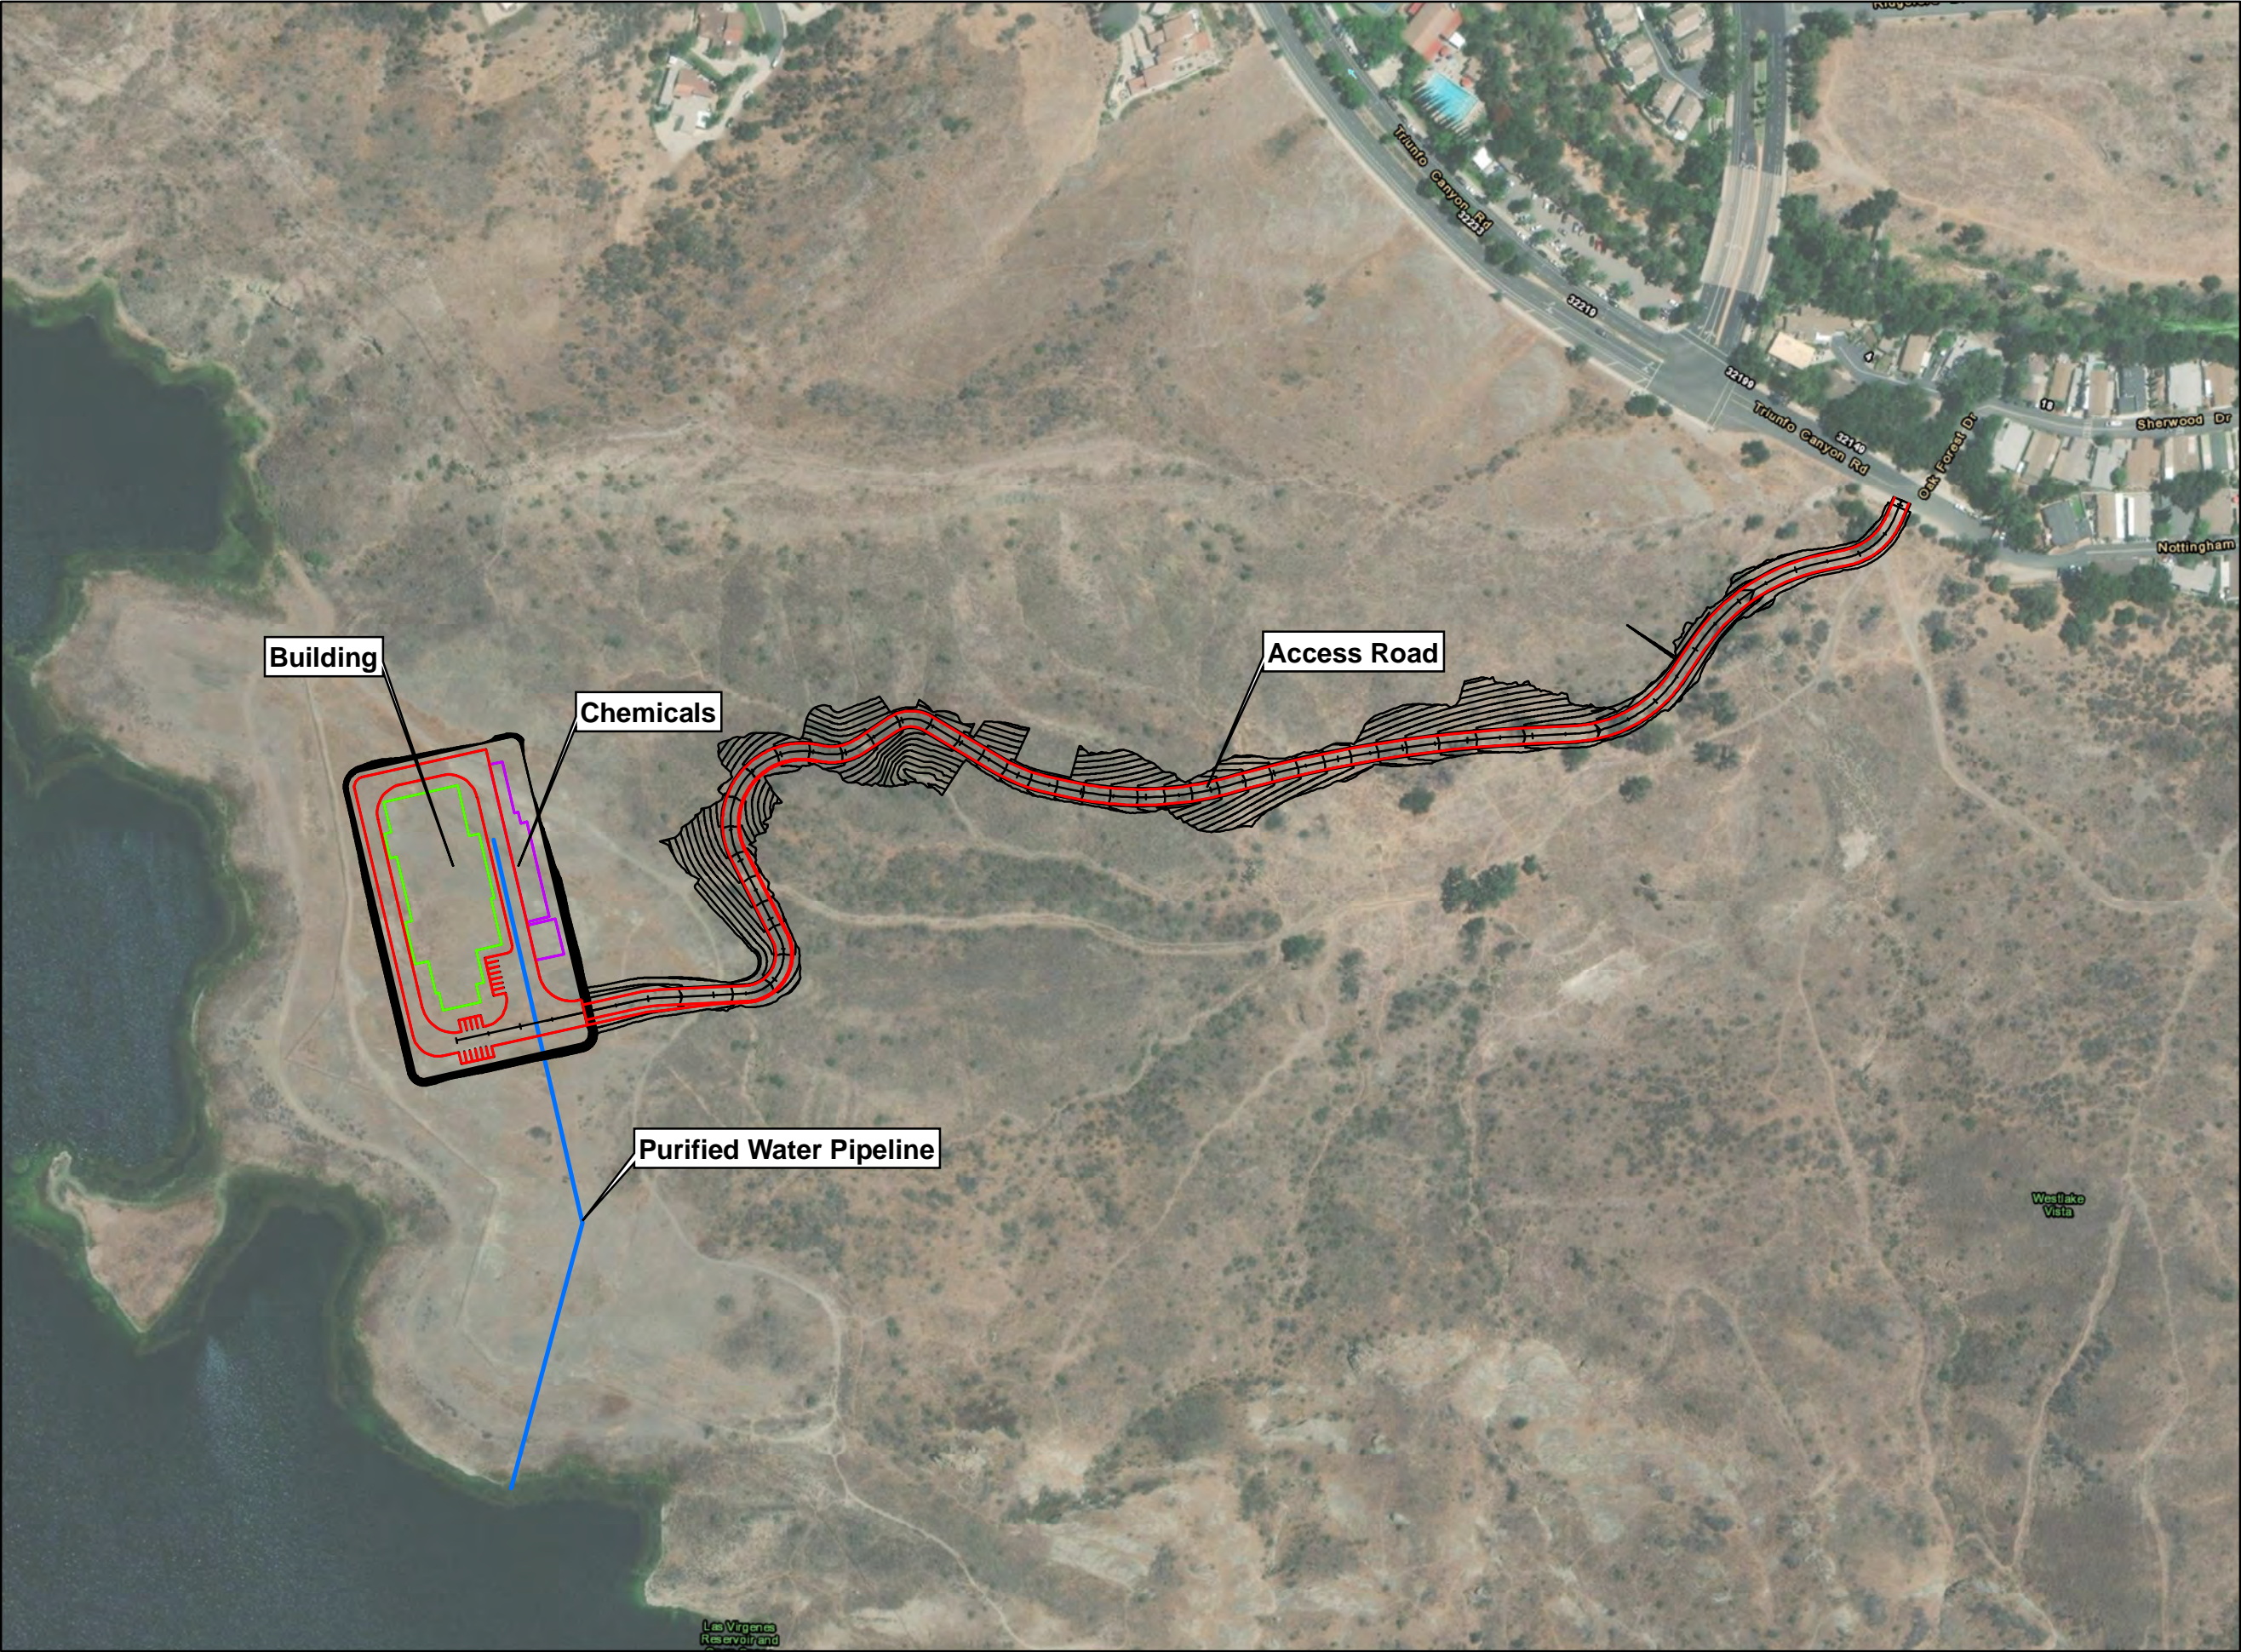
shows the conceptual design for the new access road. Additional details about new access road are expected to be developed over time if Alternative 2 Reservoir AWPf is selected as the preferred alternative. The JPA would collaborate with the property owner and recreation interests to explore how the new access road can coexist with recreation uses within Triunfo Canyon Park, such as the Pentachaeta Trail.
